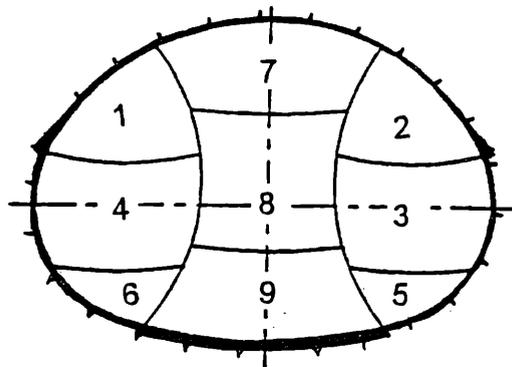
Typical excavation sequence of NATM underground stations. Width=16.5m, height=12.7m.
